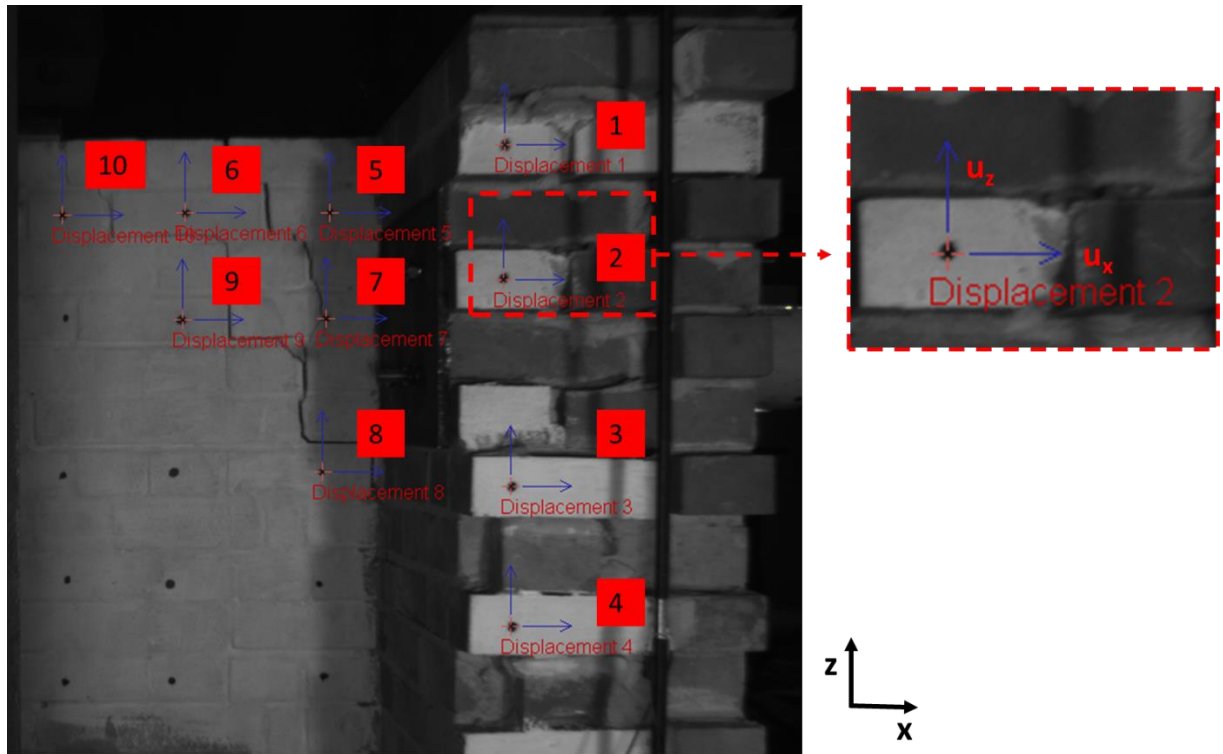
Location of tracking points (TP) on the cracked surface of the specimen
